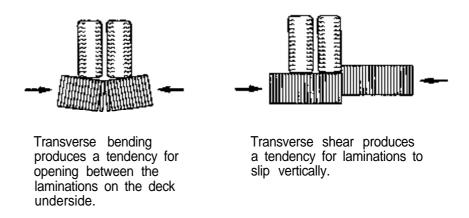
Actions that tend to reduce the platelike behavior of a longitudinal stress-laminated bridge deck.
